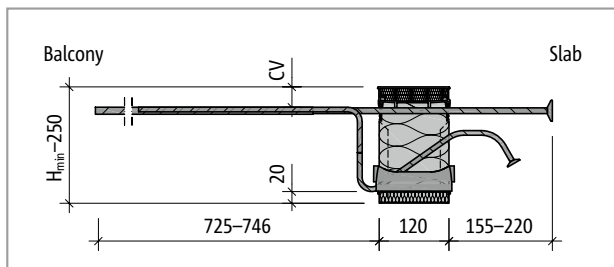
Schöck Isokorb® XT type K-U-M2: Product section
